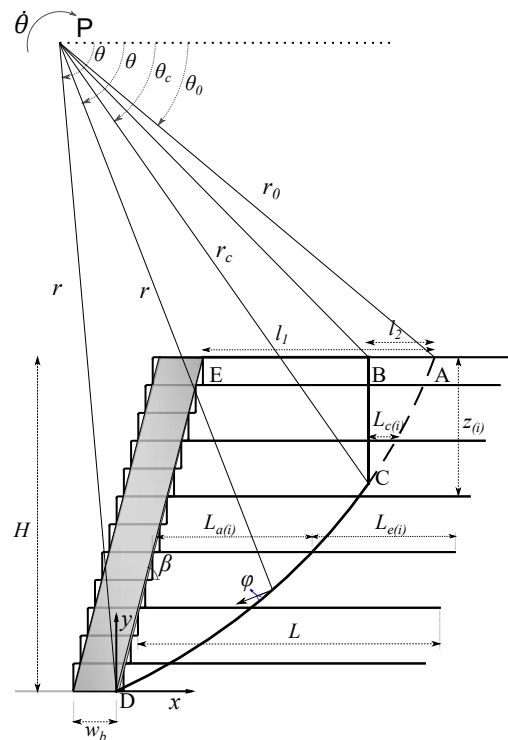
Rotational failure mechanism in a reinforced soil wall with a vertical crack and notations. Two types of wall facing considered: modular block facing and full-height rigid facing (in grey).
